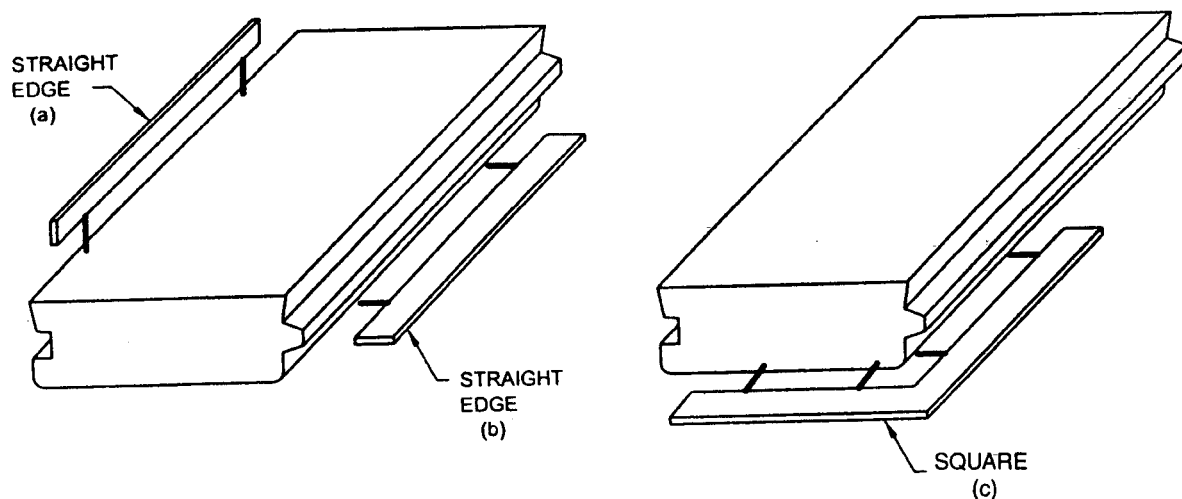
ILLUSTRATING FORM TOLERANCES OF FLOOR AND ROOF SLABS
